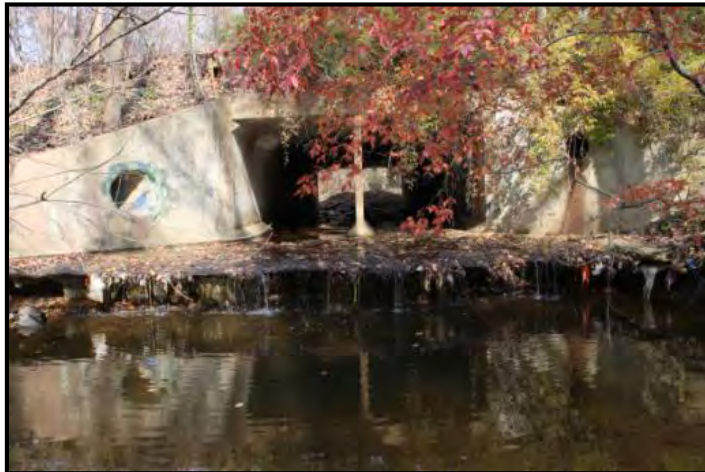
Downcutting and a large scour pool at the Queensberry Avenue culvert
